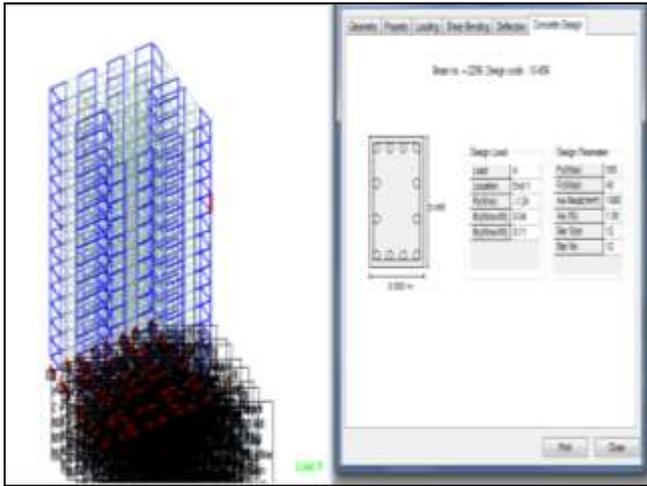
REINFORCEMENT DETAILS IN COLUMN 2296
